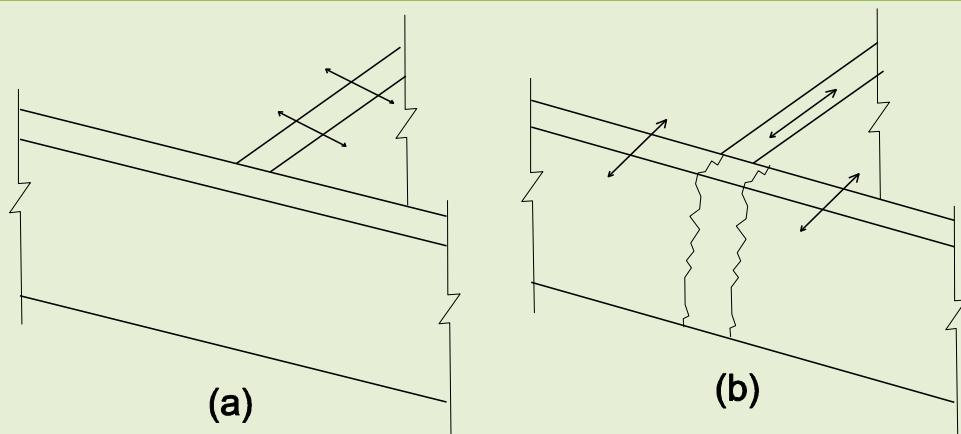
Illustrations showing (a) how separation can occur between in-plane and out-of-plane walls, and (b) how vertical cracks develop in out-of-plane walls at the intersection with perpendicular, in-plane walls. (source: Manual of The Getty Conservation Institute)
